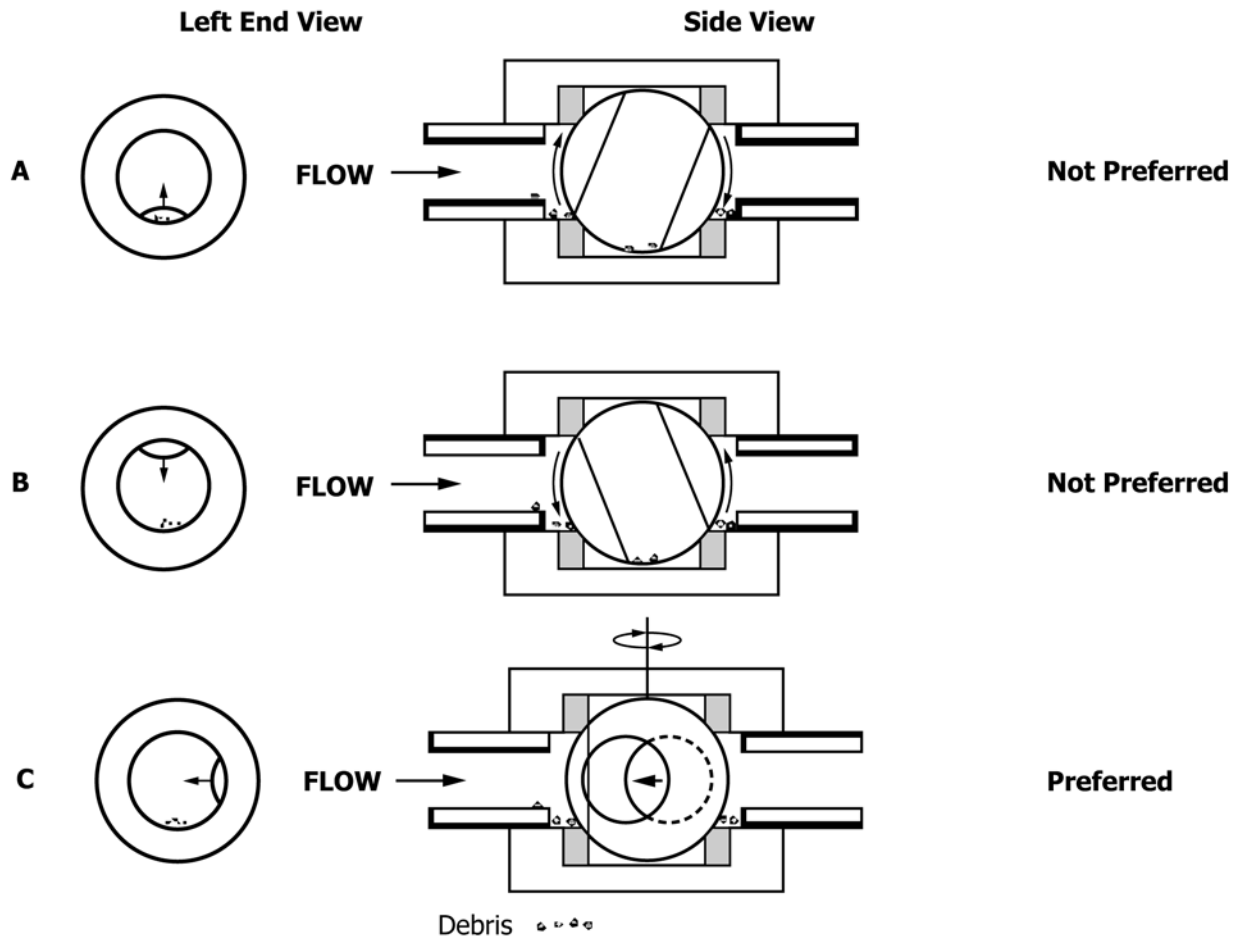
Debris in Ball Valve Installations, Side and End Views
